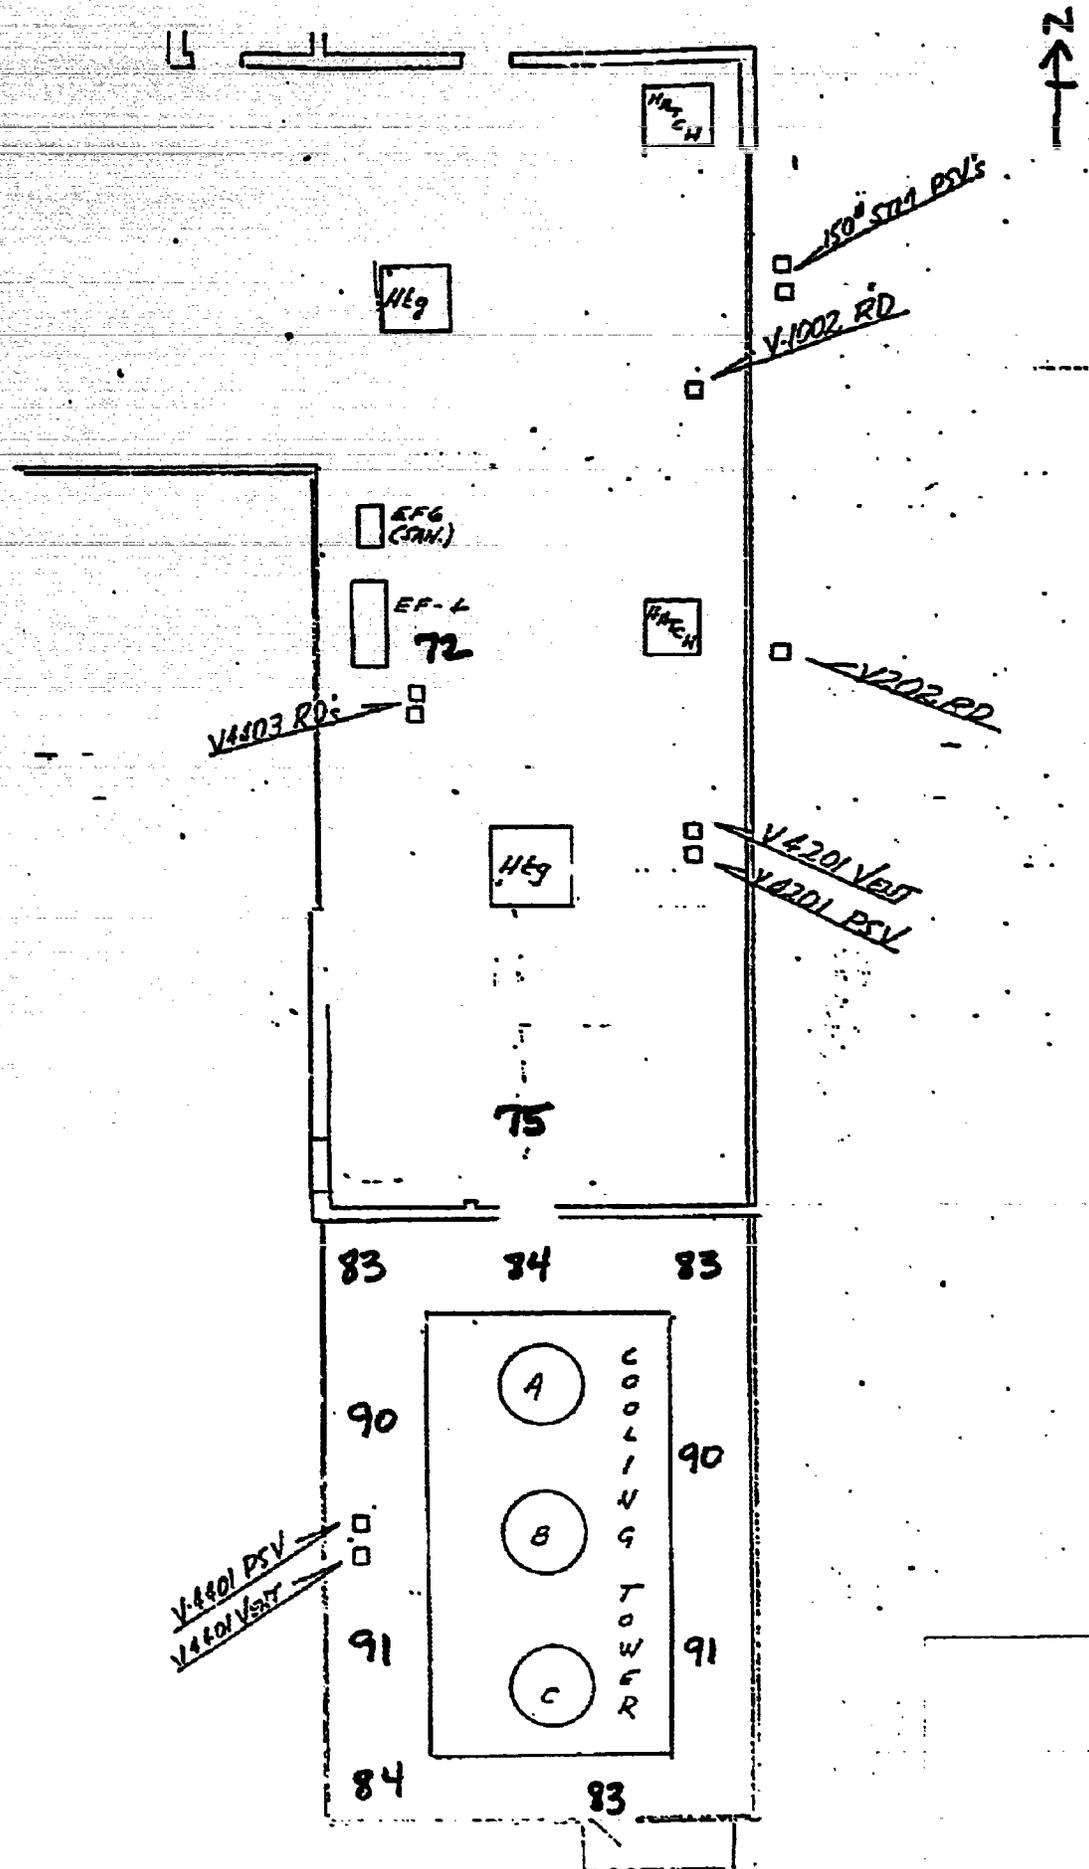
AREA NOISE LEVEL MEASUREMENTS, BUILDING, WEST WING ROOF, MICHIGAN DIVISION HERBICIDES PLANT, MARCH, 1989. HEH23.14-11-2(22)
